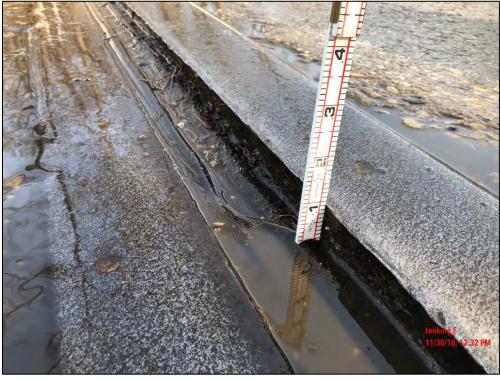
West abutment expansion joint opening measuring 2.5" with a 1" settlement. Joint glands are submerged in water and exposed gland areas have failed.
